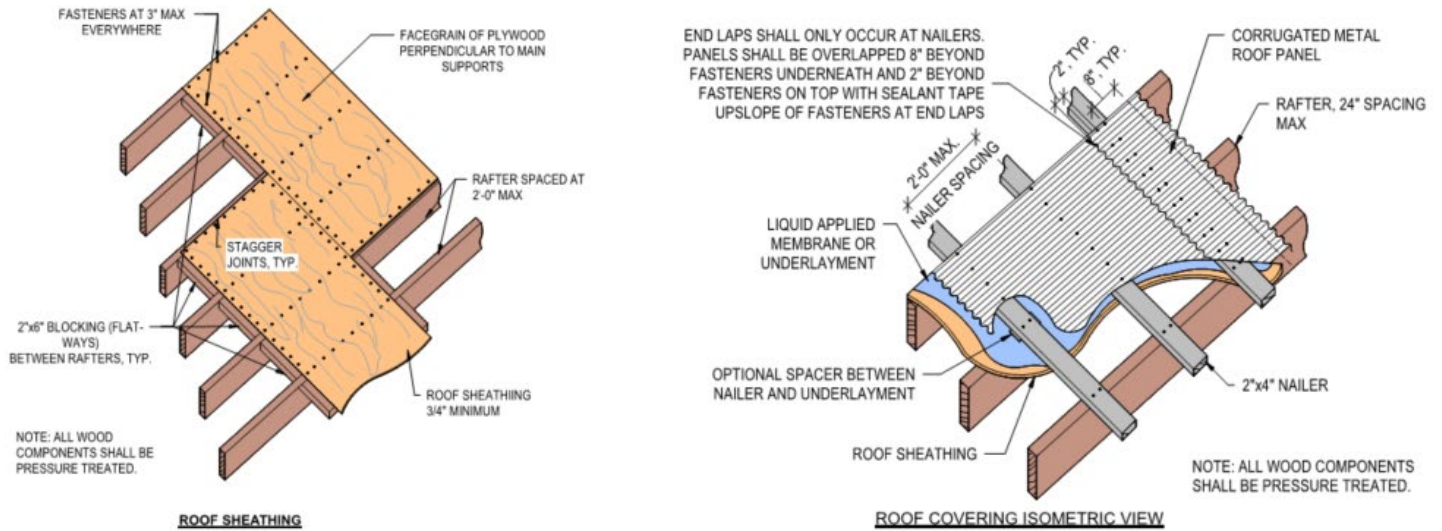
Construction detailing for strengthening roofs in the CNMI.
